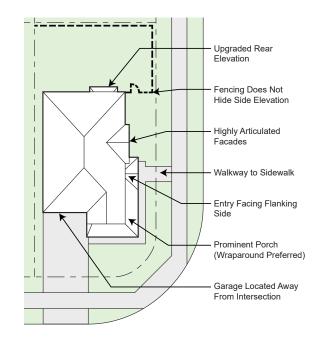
Conceptual plan view of Corner Lot Dwelling
